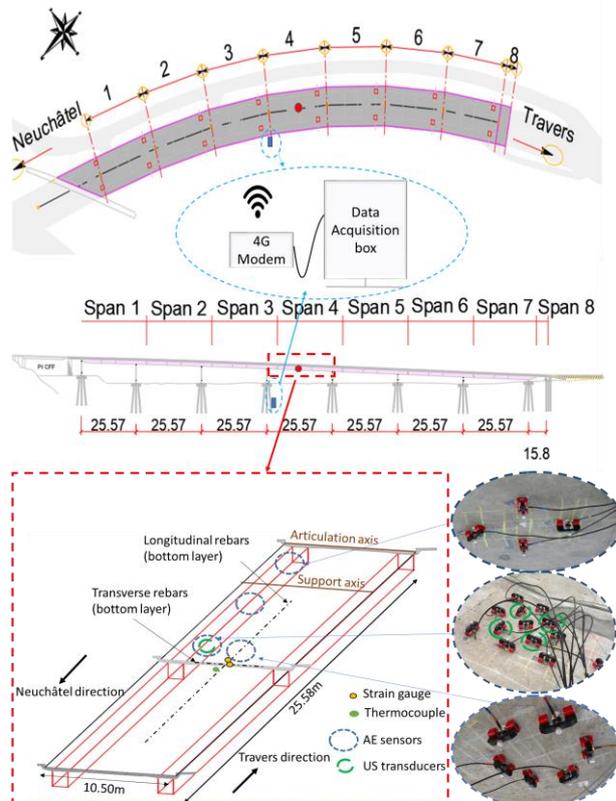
Drawing of the viaduct (plan view and elevation side) - data acquisition system – instrumented slab; dimensions in [m].
